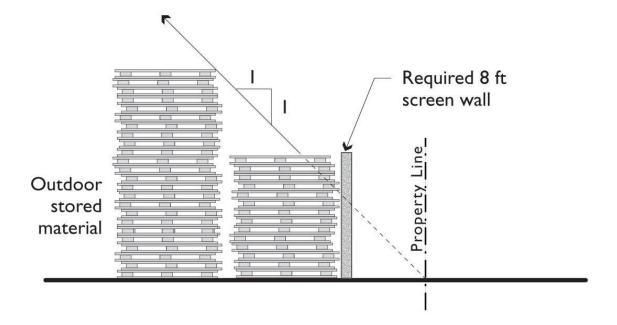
B.3: OUTDOOR STORED MATERIAL
